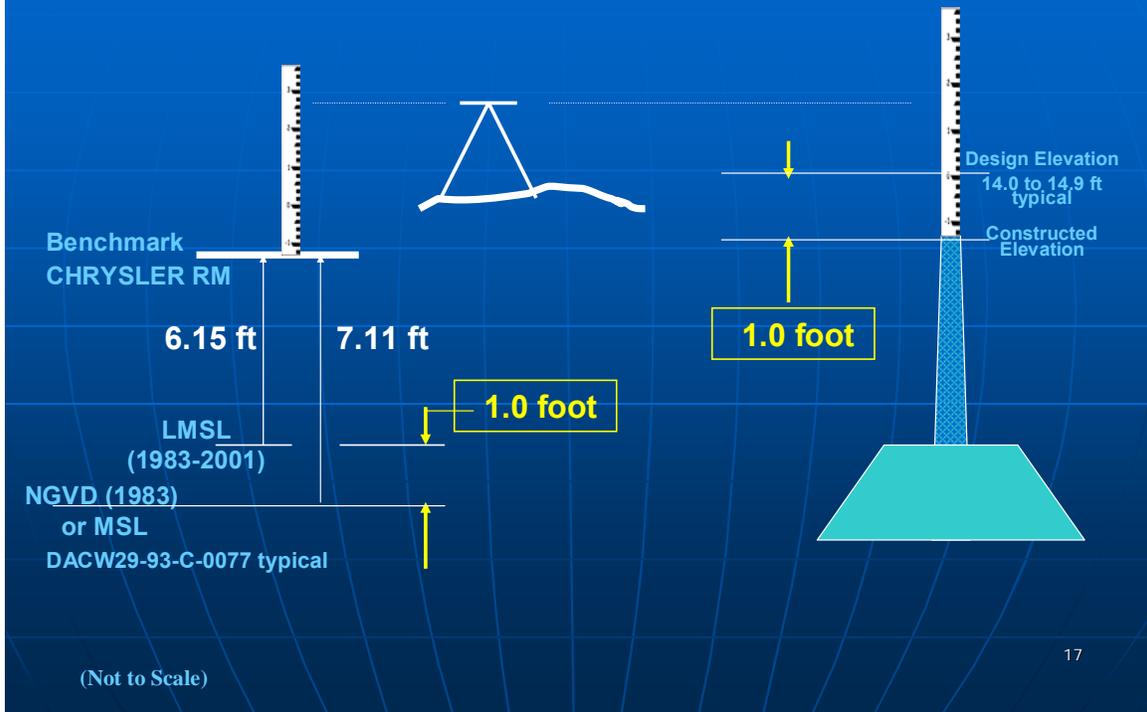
Impact of using NGVD elevation instead of LMSL elevation for construction stakeout of Orleans Avenue Outfall Canal floodwall construction (DACW29-93-C-0077). (Elevation differences are rounded to the nearest tenth of a foot.)
